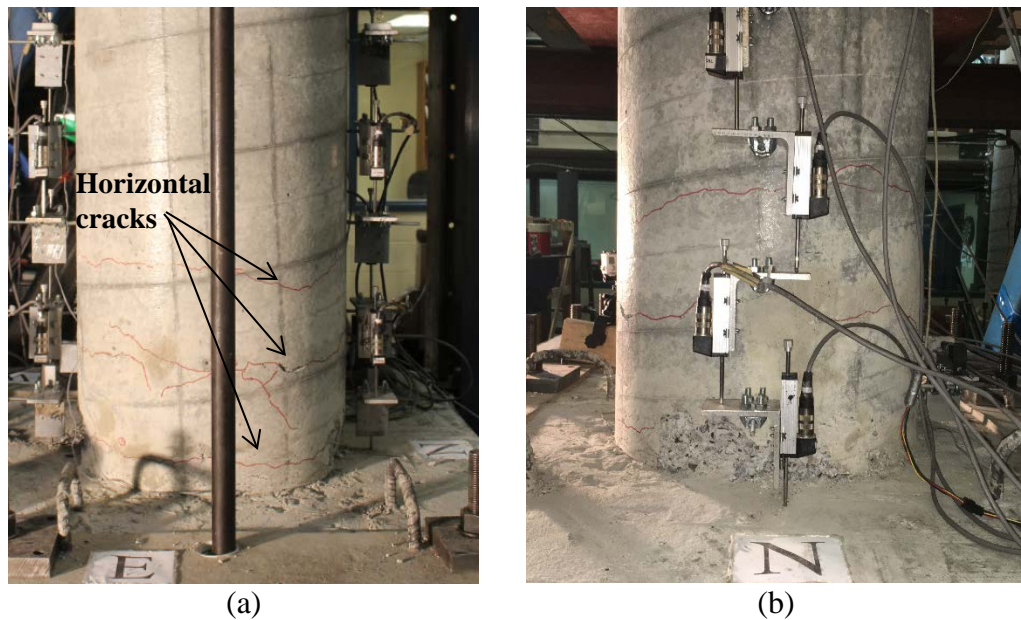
Damage in Column 3 for 1.77 x Iwaki Y. (a) Horizontal and vertical cracks (b) Spalling of concrete cover
